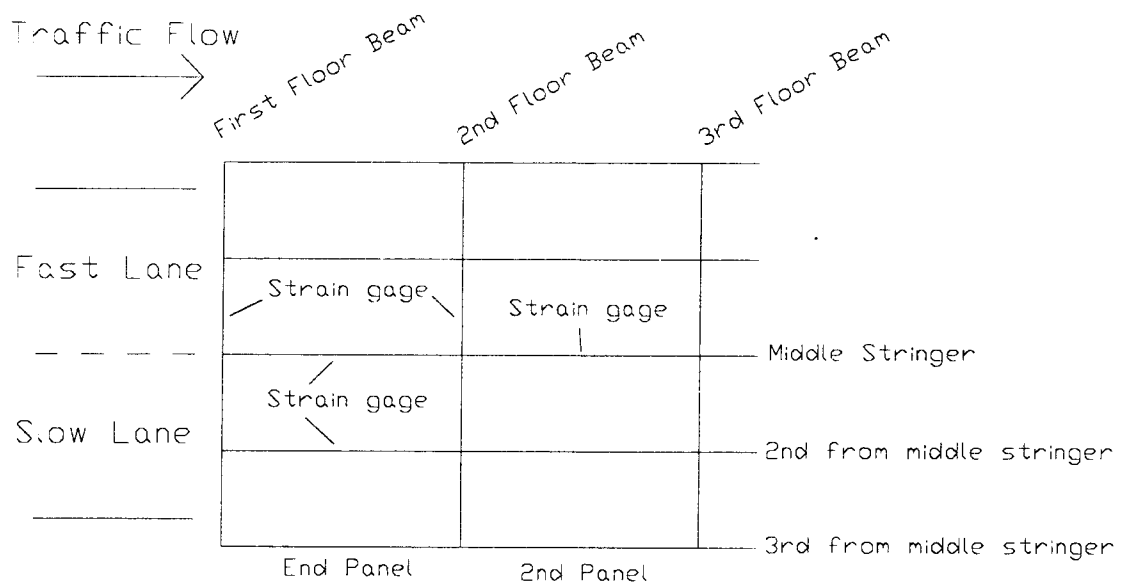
Three stringers and two floor beams on the northbound structure of the Winchester Bridge that had strain gauges installed.
